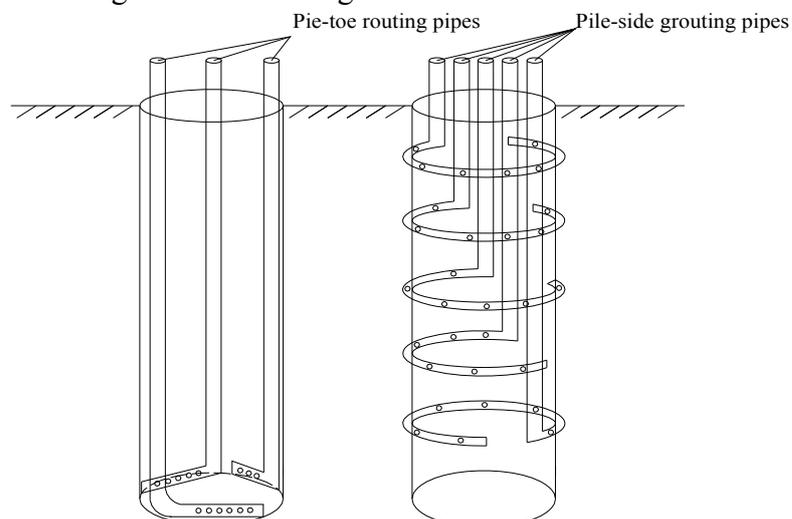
Setting of pile-toe and pile-side grouting pipes
